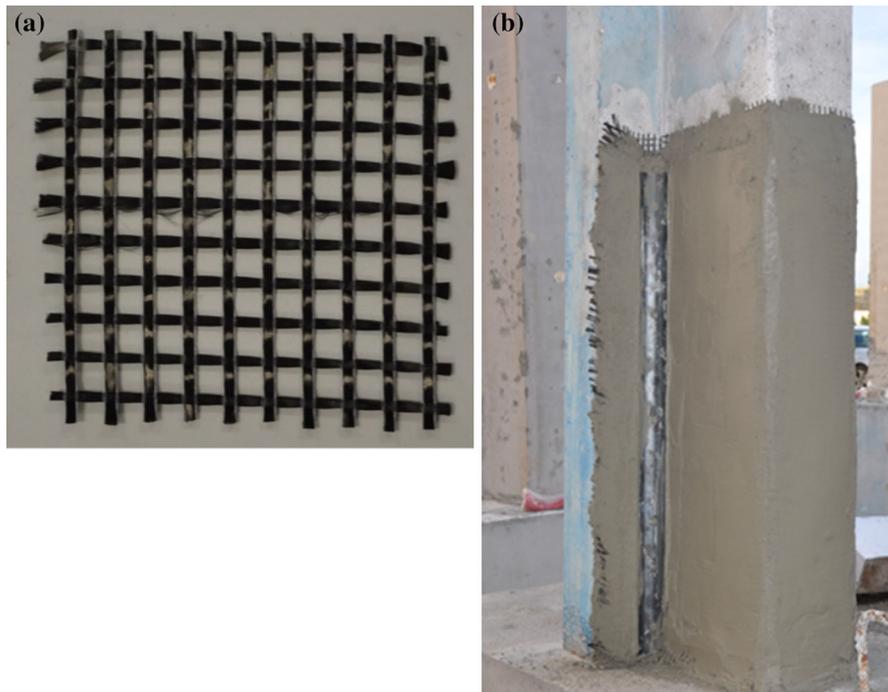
a Textile architecture; b TRM jacket with anchorage
